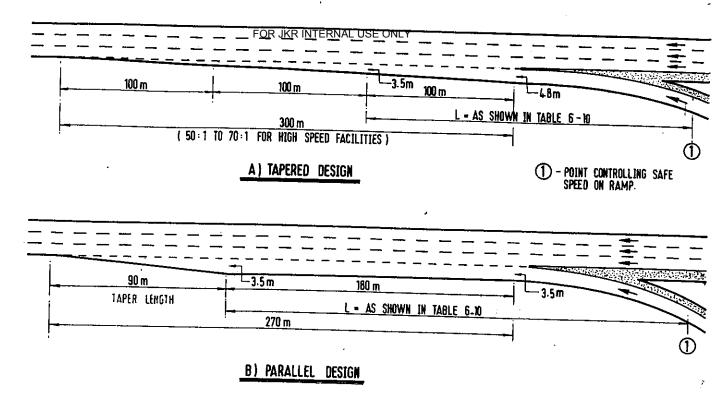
SINGLE LANE ENTRANCE RAMPS
